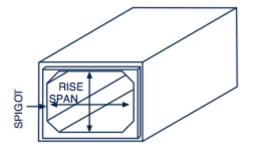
Precast Solid Box Culvert (Shaw Pipe 2009)
